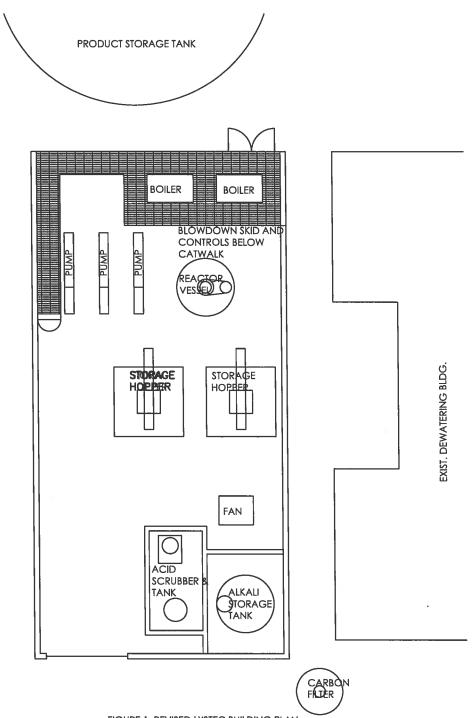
REVISED LYSTEC BUILDING PLAN SCALE: 1: 4
